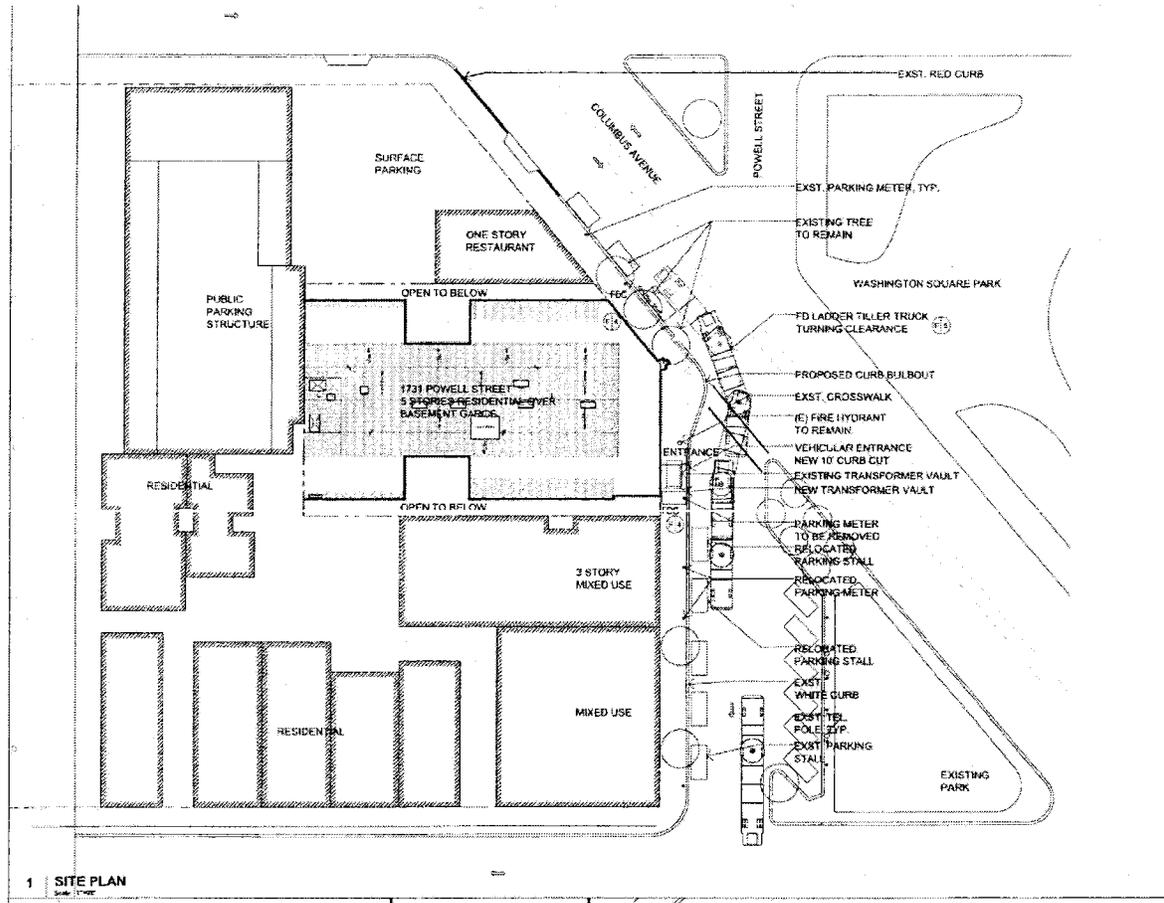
PROPOSED 1731 POWELL ST SITE PLAN
